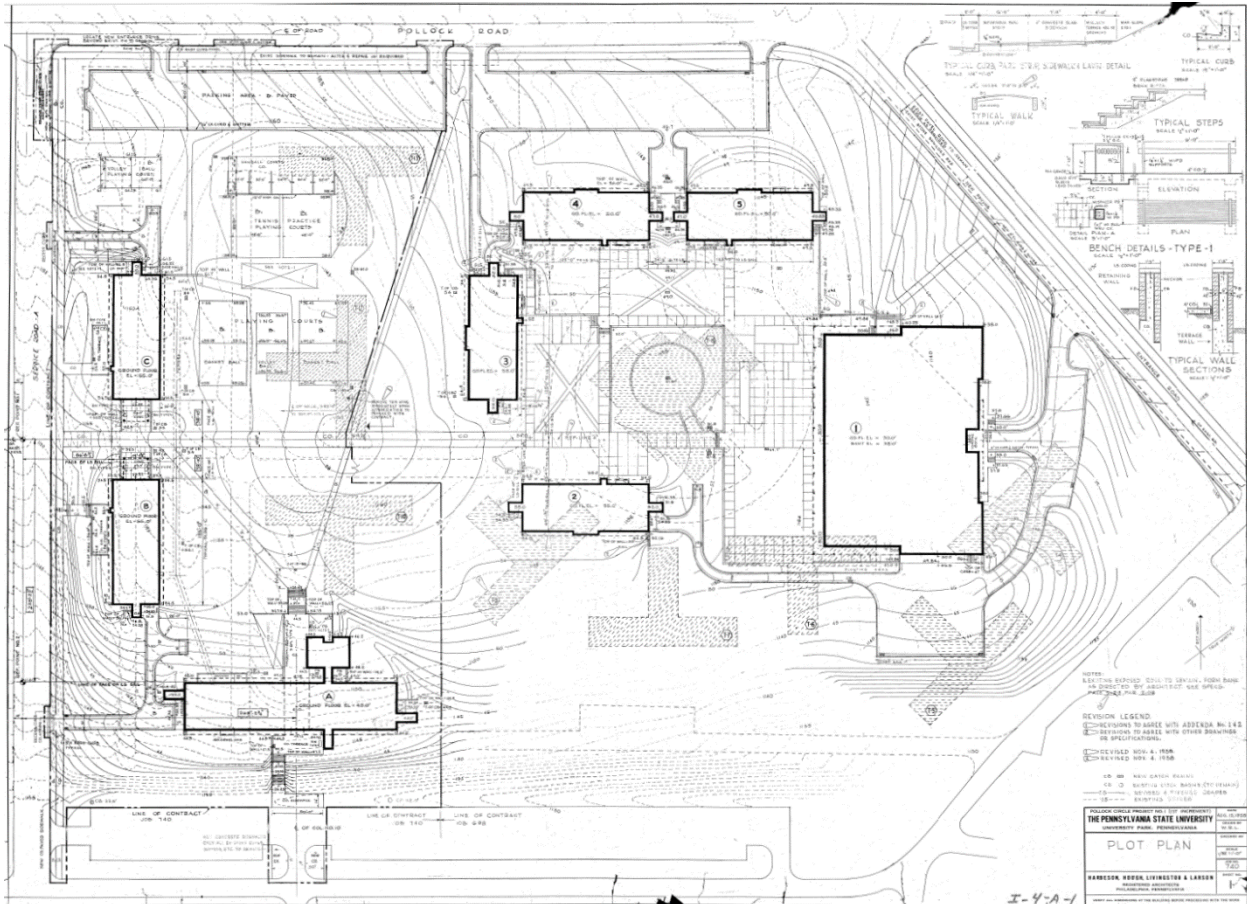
Plot Plan from Original Construction Drawings, Note Outlines of Pollock Circle Buildings Removed
